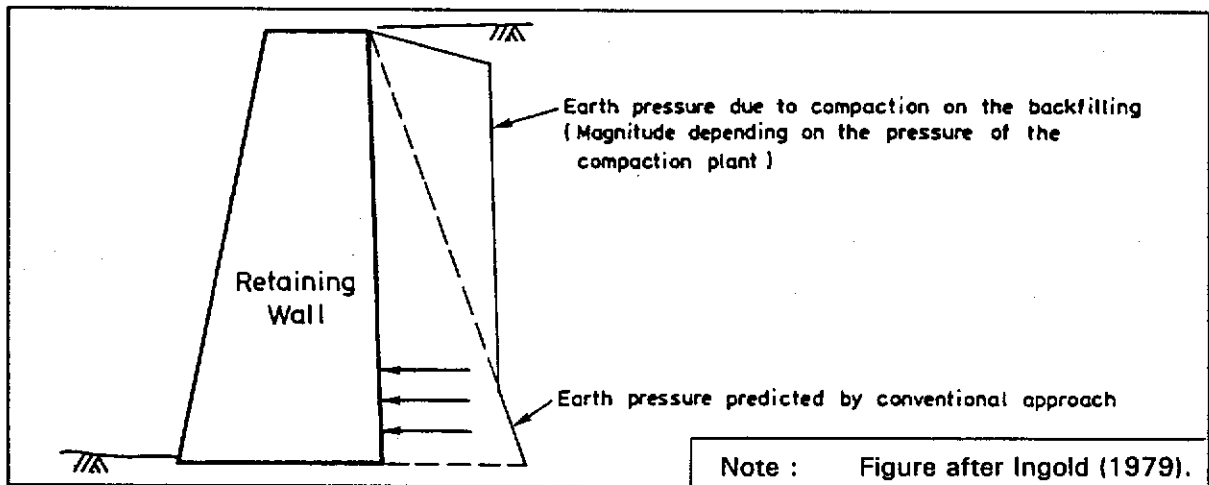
Pressure on Retaining Wall with Compacted Backfill
